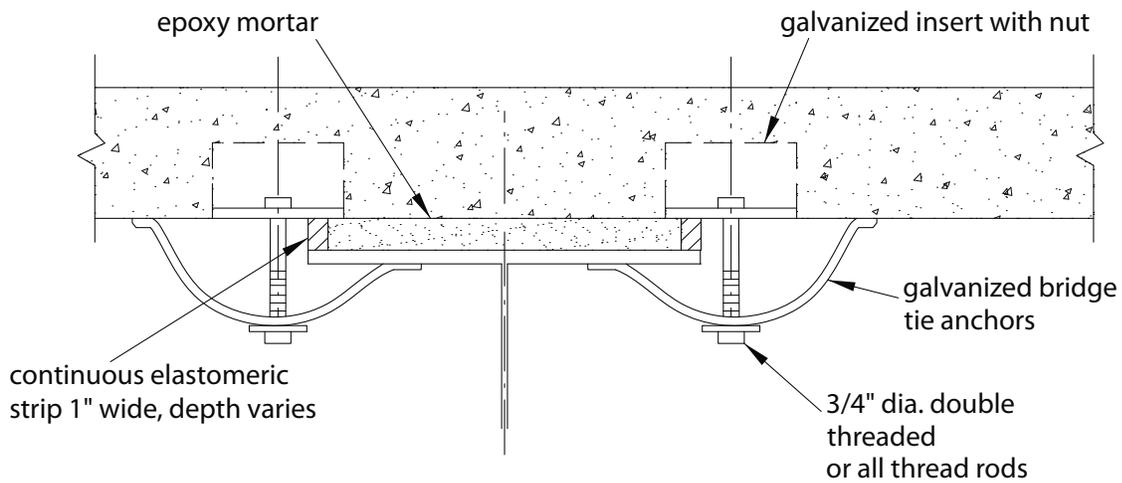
Grout dam built using elastomeric strips (Clark's Summit Bridge, Pennsylvania Turnpike).
